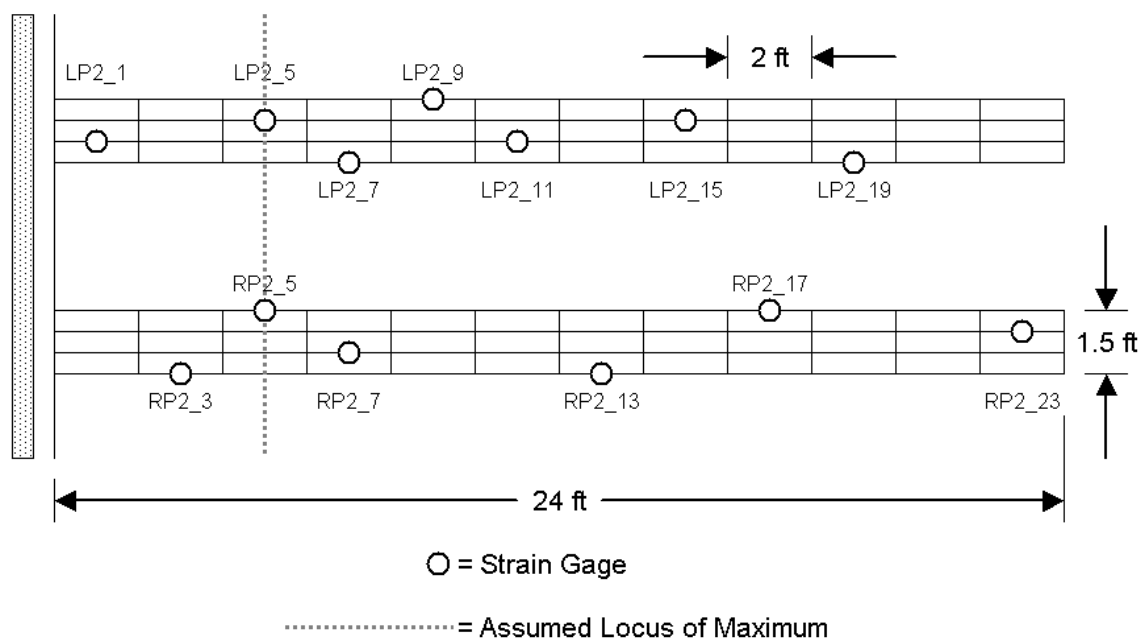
Plan view of instrumented primary bar mat PL2 at level 2 located in the primary reinforced only section.
